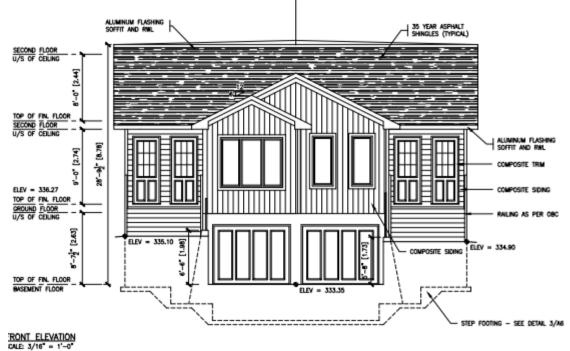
Proposed Front Elevations – Semi-detached duplex dwelling
